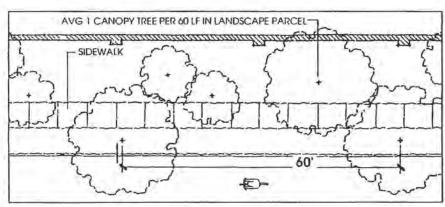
Typical plan detail, Laurel Road west of Route 4 Bypass.
